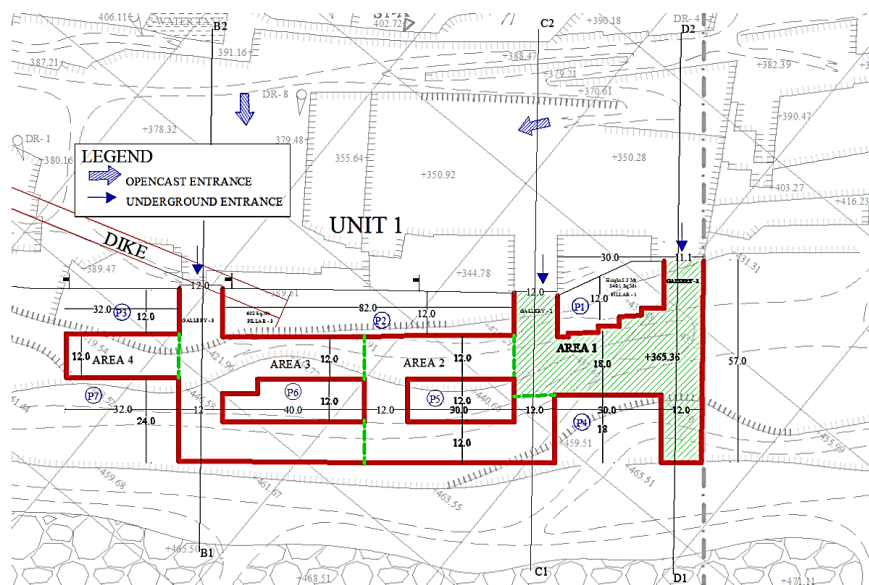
Map showing underground workings, detailing Room and pillar arrangements.
